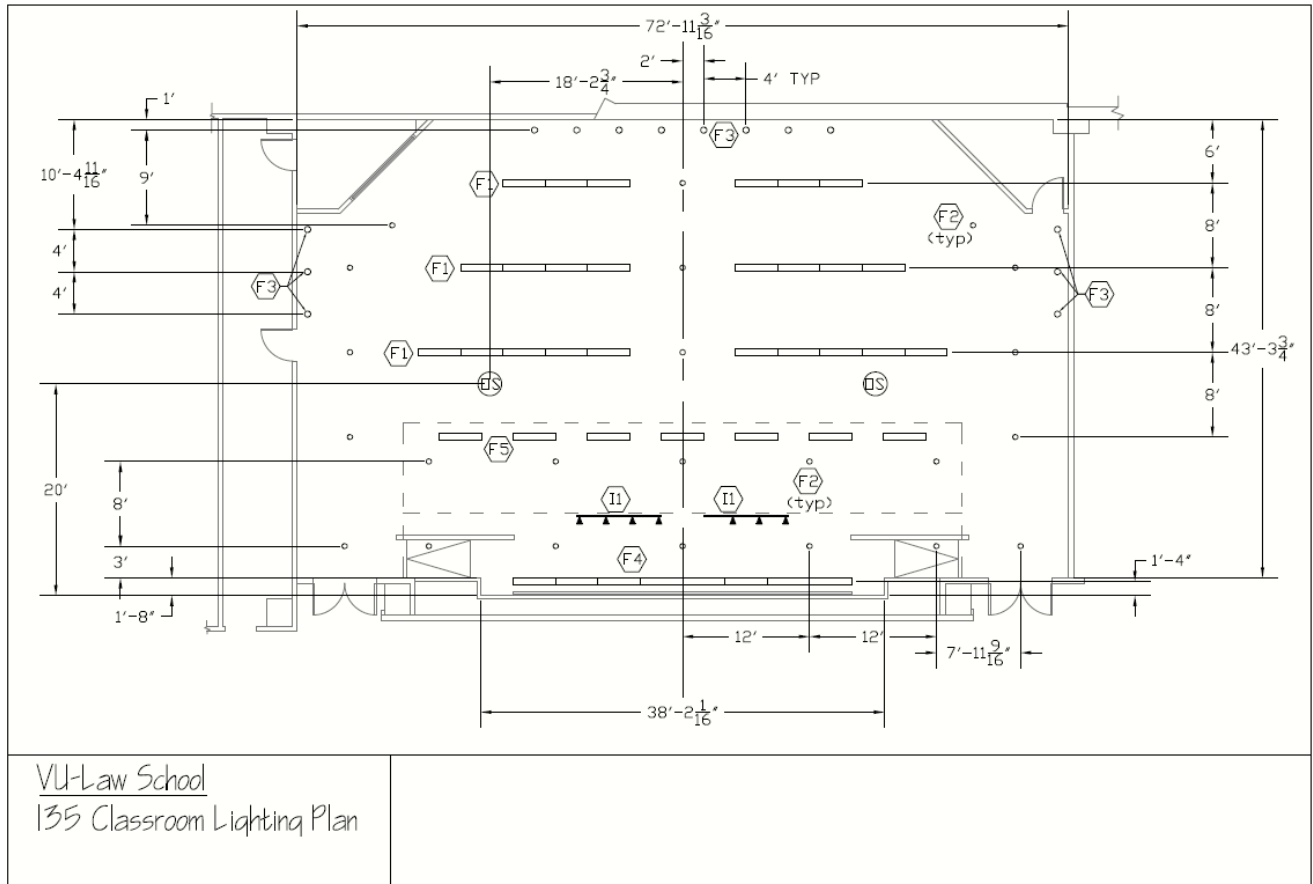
135-Seat Classroom Lighting Plan
